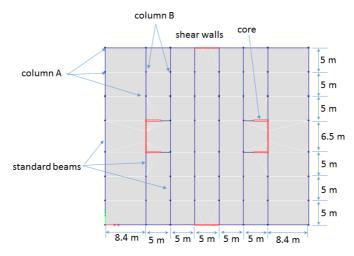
Typical floor plan of the torsionally balanced 20-storey building
